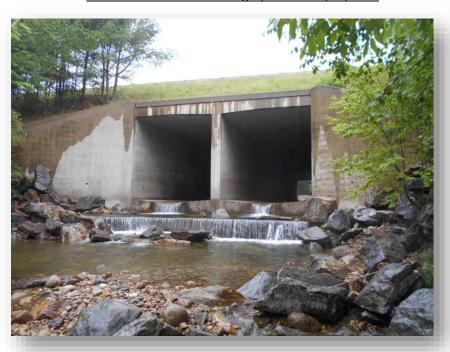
Outlet Side Looking Upstream - 7/17/2018
